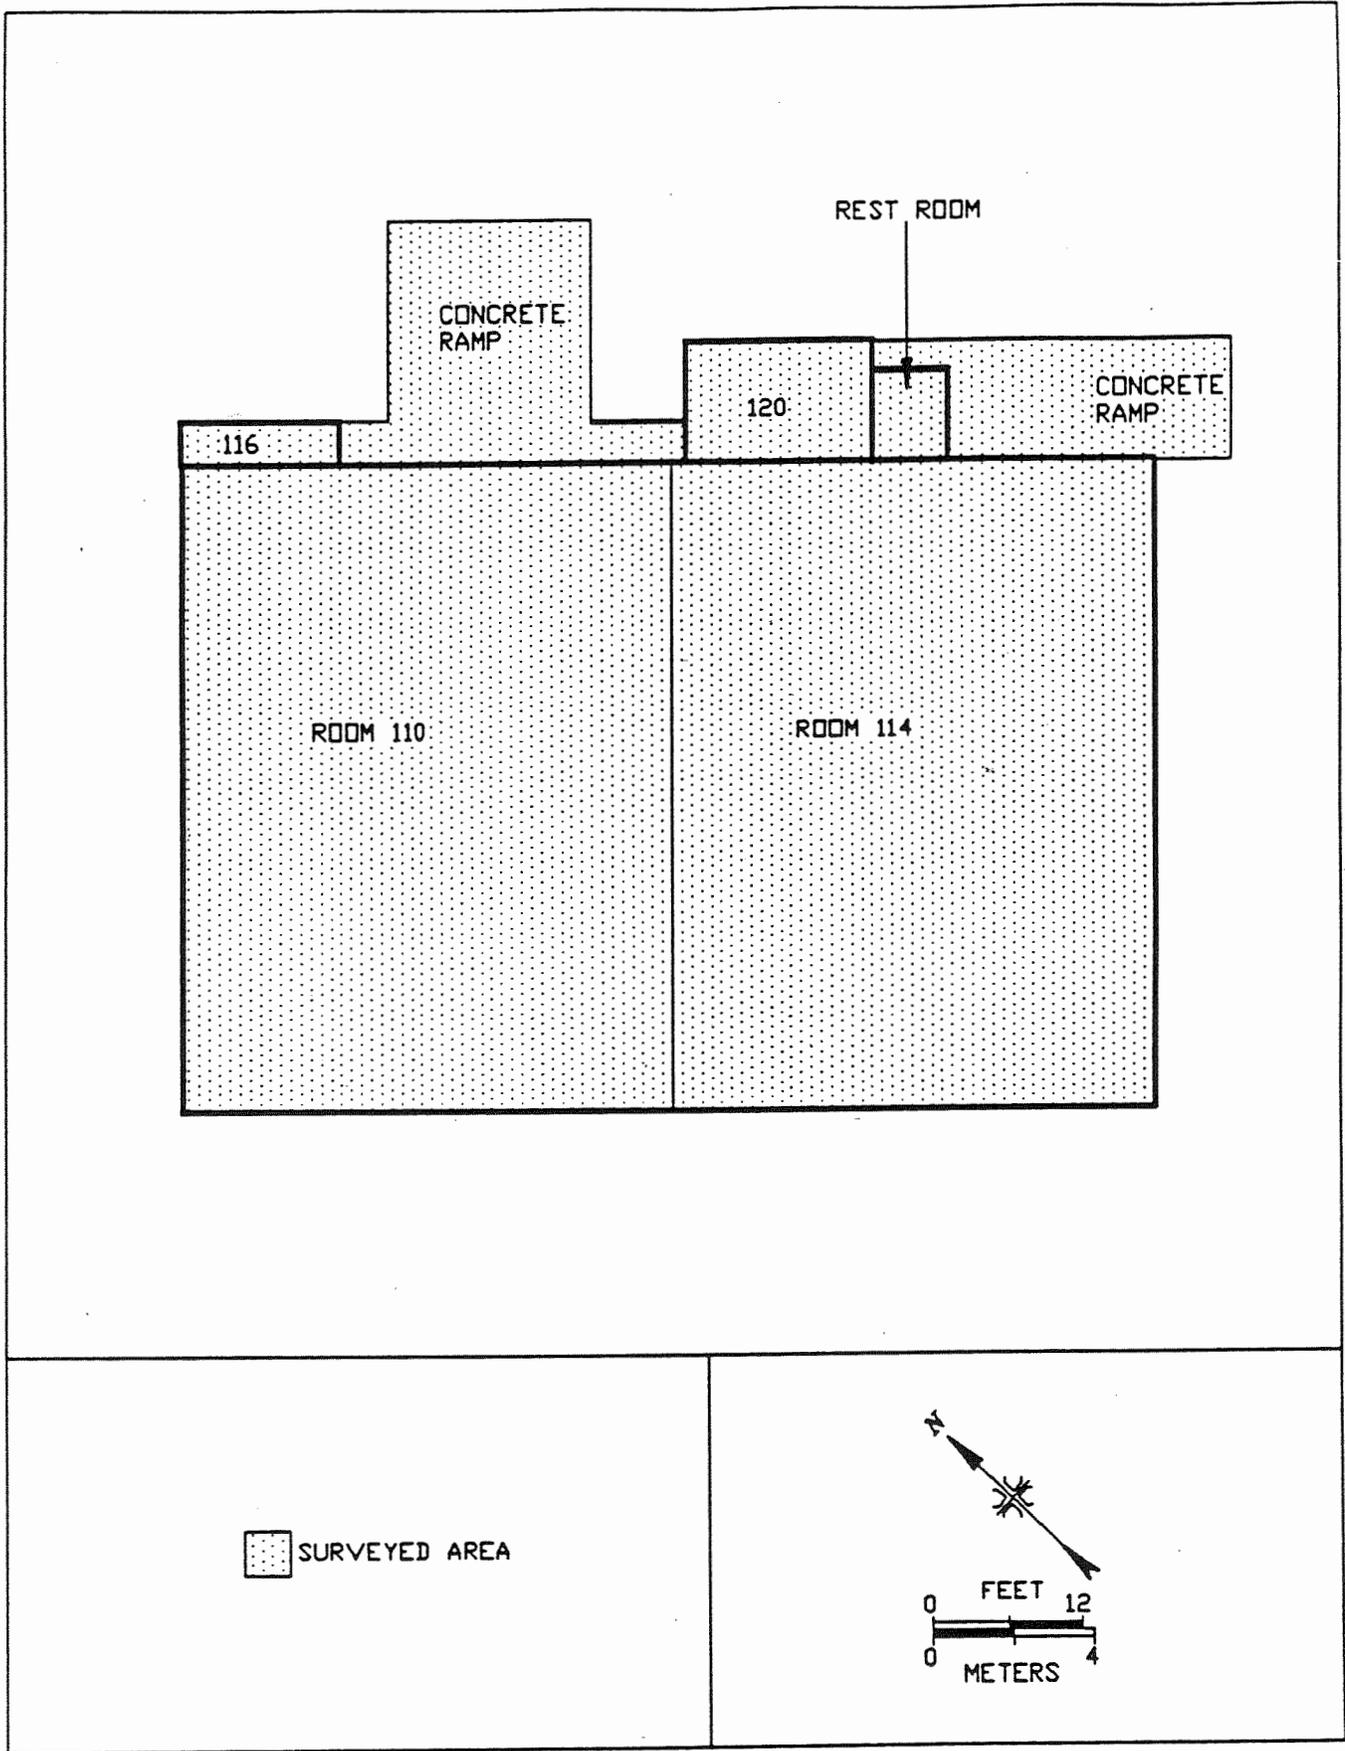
Building 064 - Floor Plan and Surveyed Areas
